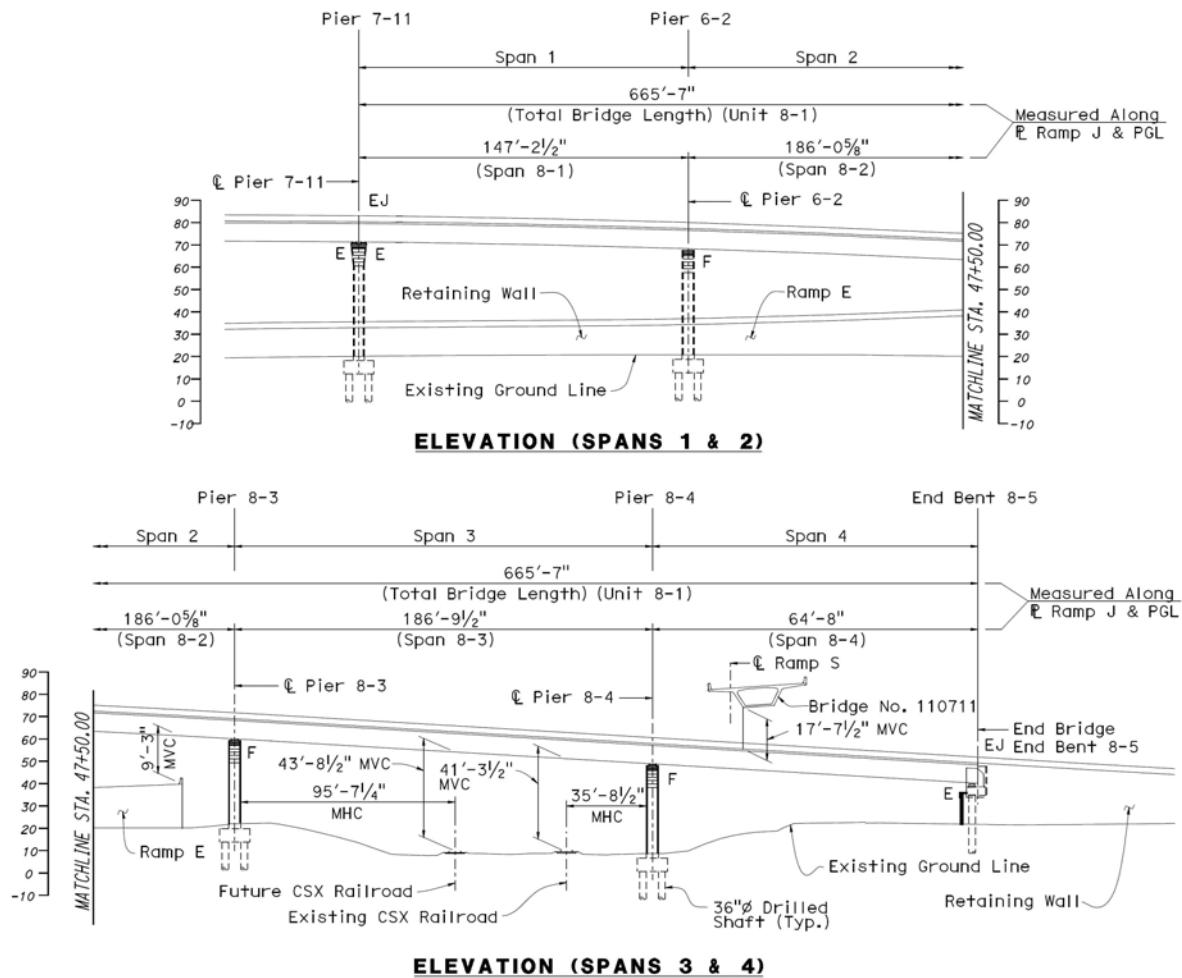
Precast Segmental Cantilever Bridge Design Example
